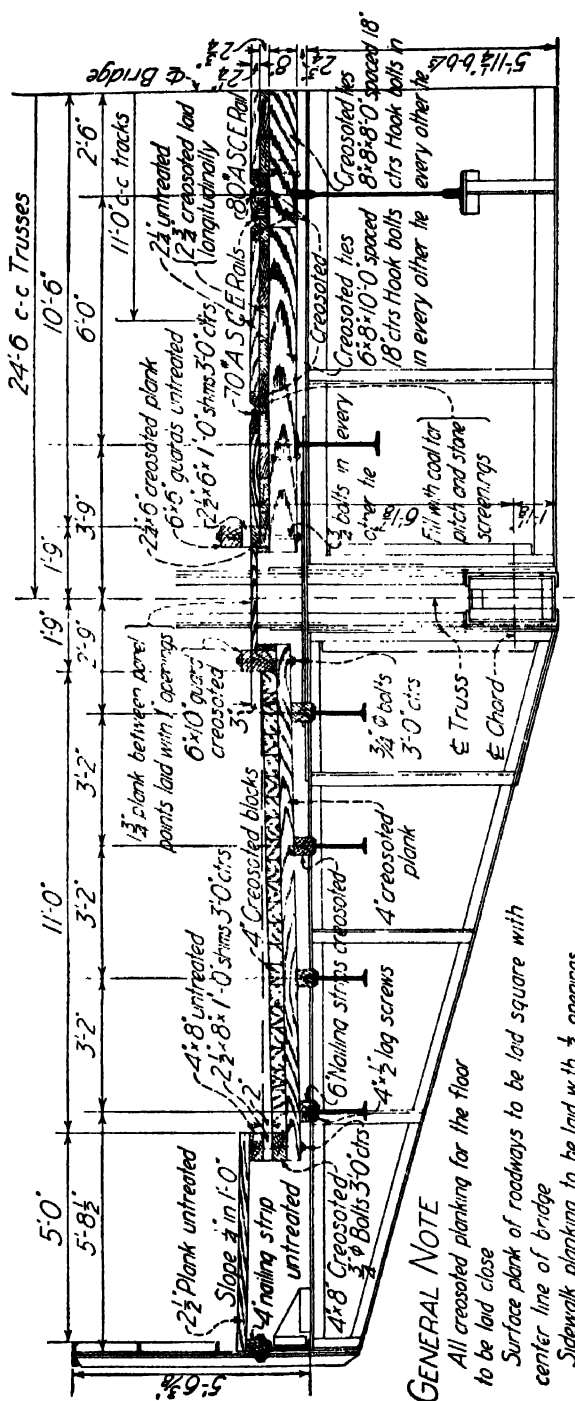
Cross-section of Floor of the Arkansas River Bridge at Ft. Smith, Ark.
